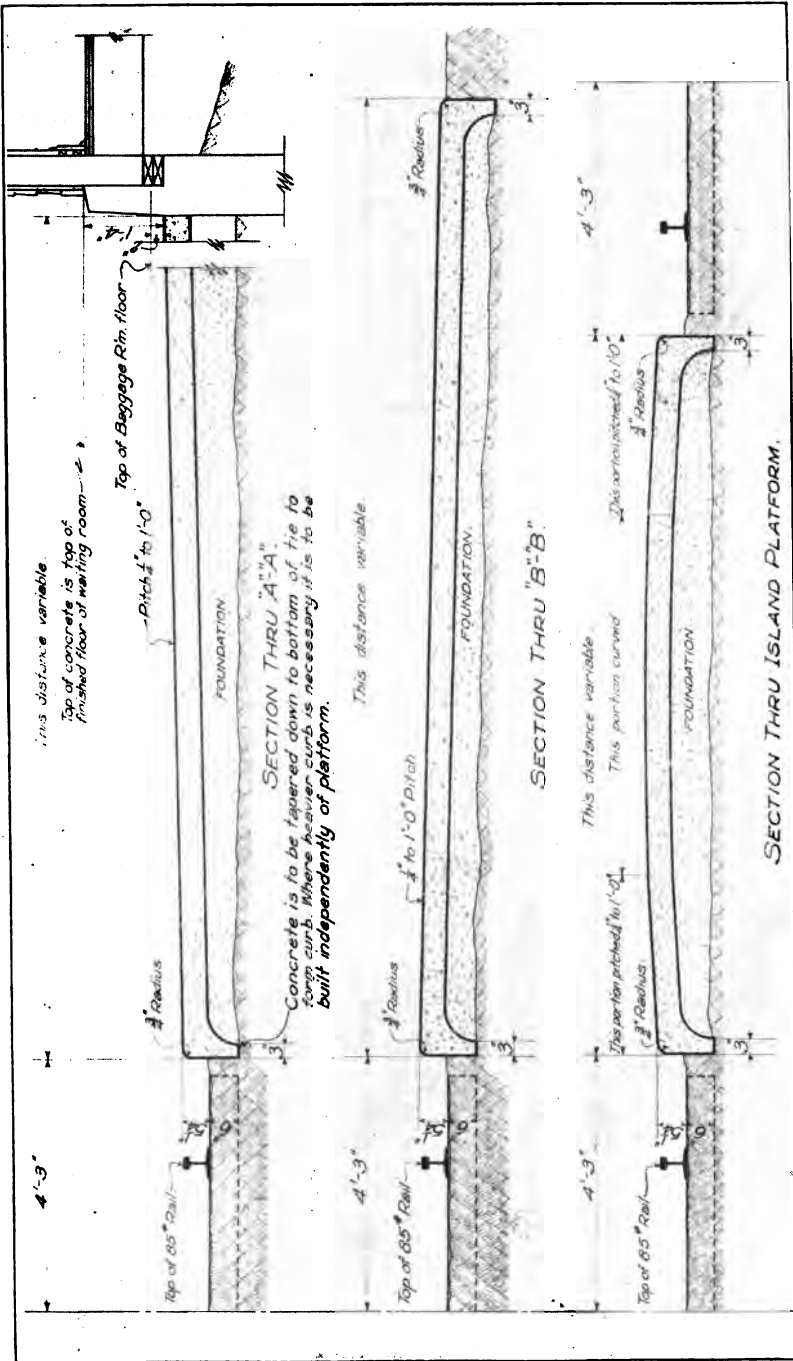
Fig. IV. Cross-Sections of Concrete Platforms, C. M. & St. P. R. R.
